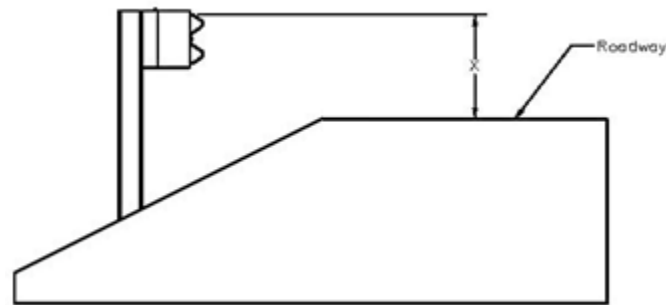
Guardrail Height Measured to the Ground at Roadway Edge
